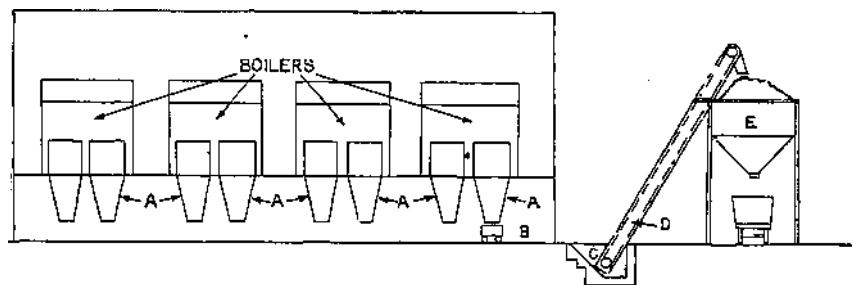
Typical Arrangement of Ash Handling Plant with Ash Wagons and Bucket Elevator
